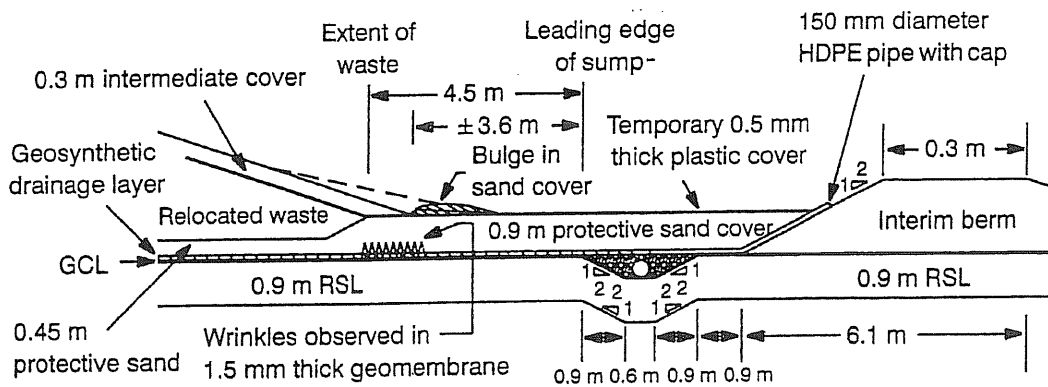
Cell 1 interim berm and temporary leachate collection trench.
